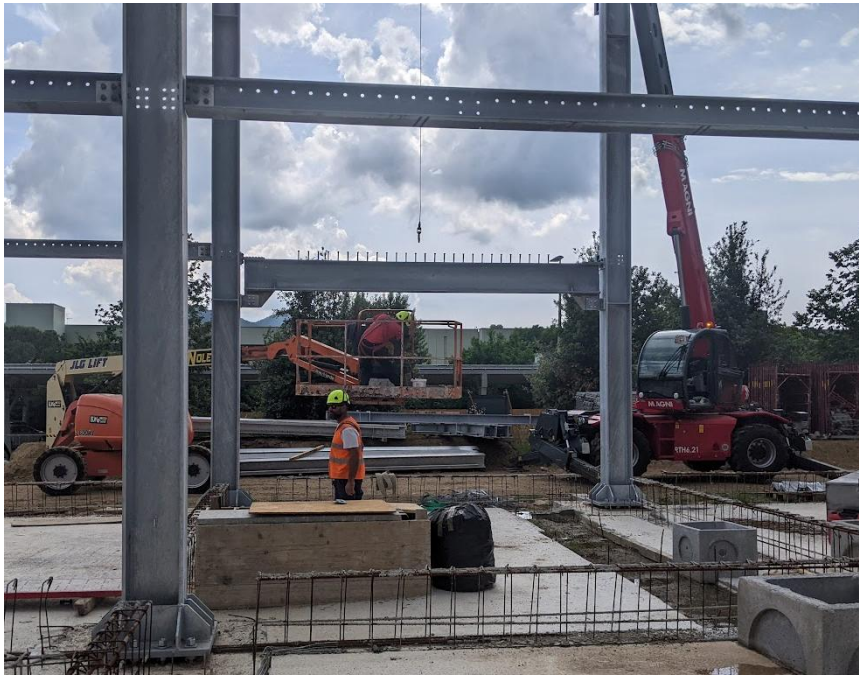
Erection of first steel beam equipped with Freedom connections
